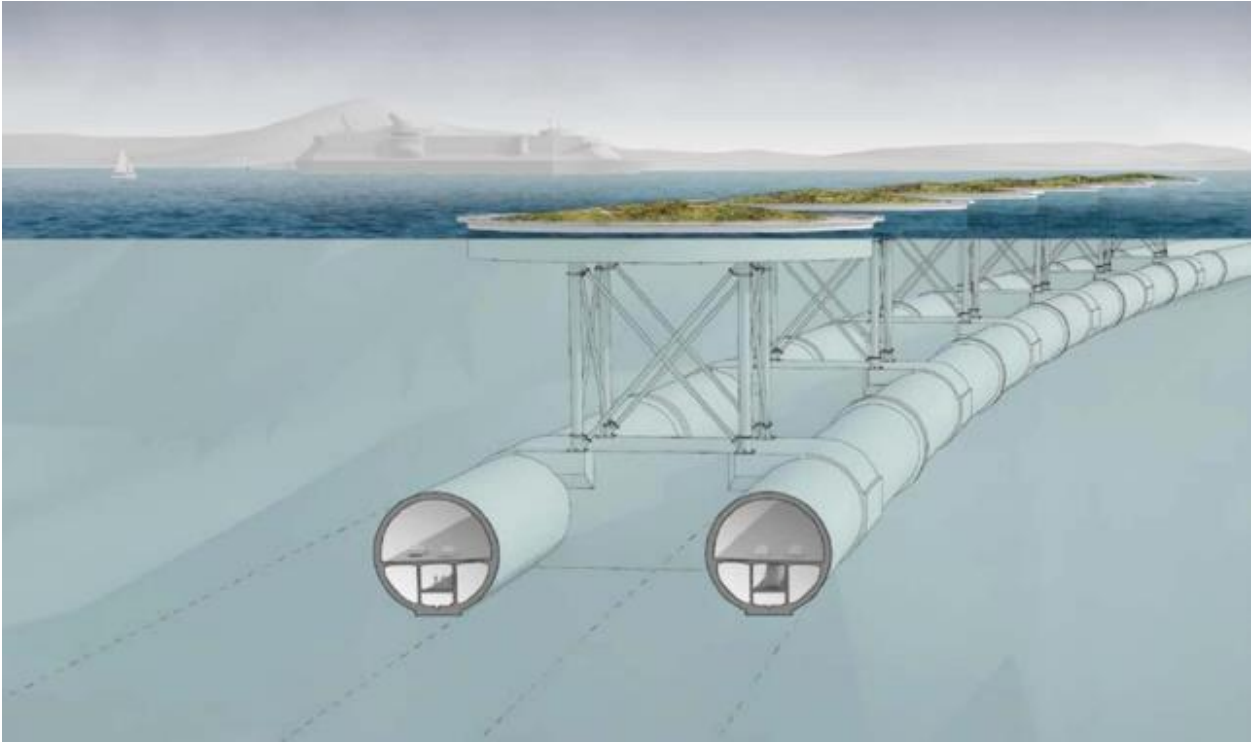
Submerged Floating Tunnel Bridge (SFTB) Design (Canh Vu).
